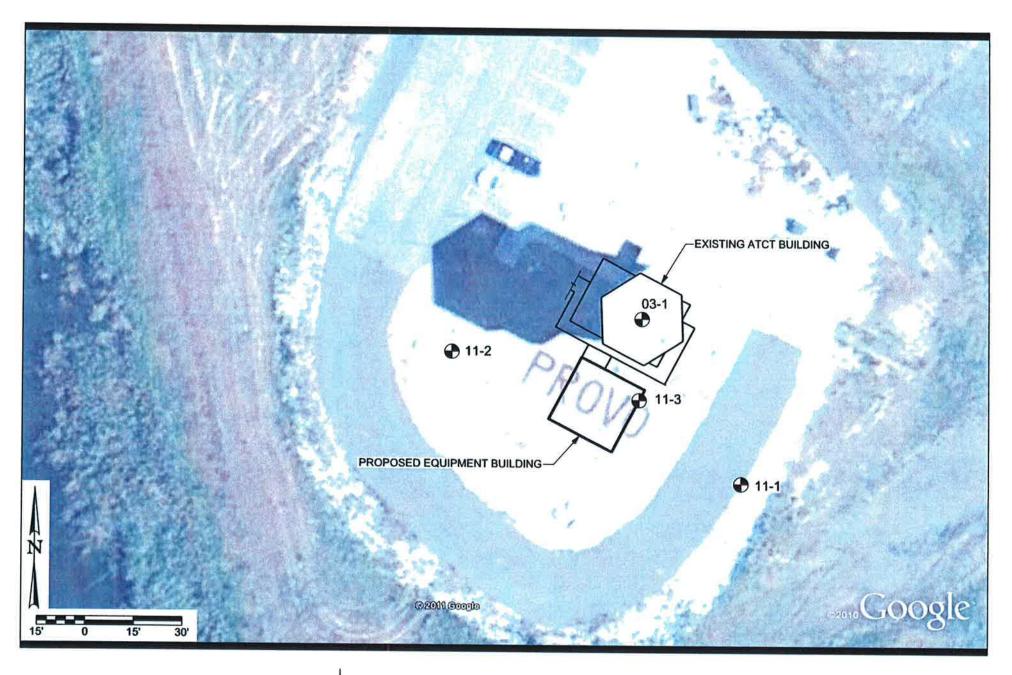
SITE PLAN & TEST HOLE LOCATIONS
